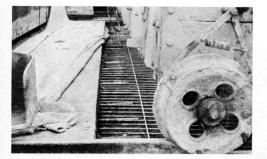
Typical joint in wire mesh reinforcement after concrete set.
